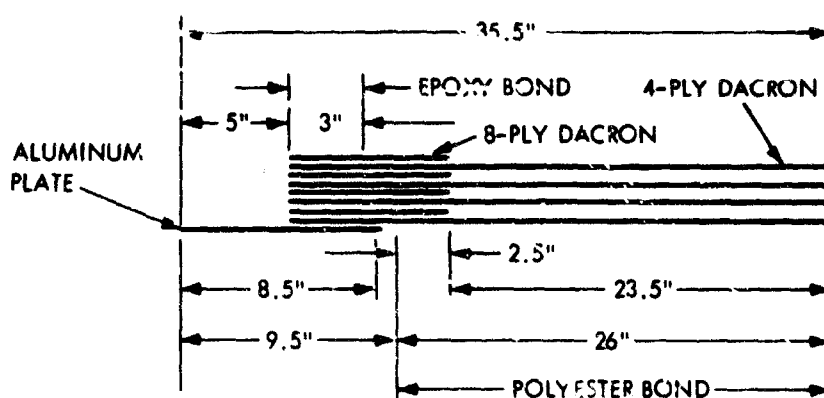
Typical Eight-Ply Dacron Floor Joint Specimen
